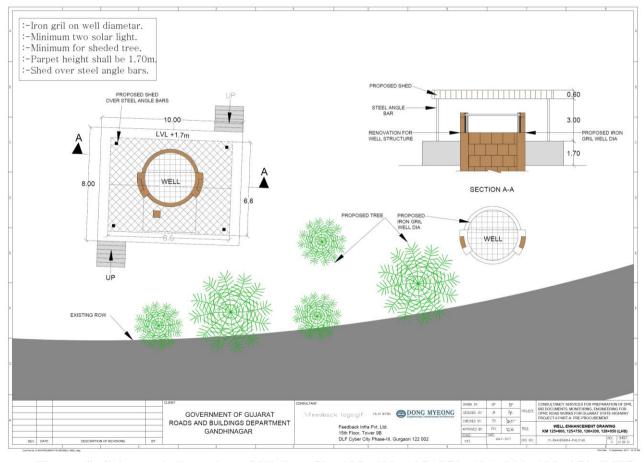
Figure S: Schematic Drawing of Well at Ch. 125+600, 125+750, 126+200, 128+050 (LHS)
